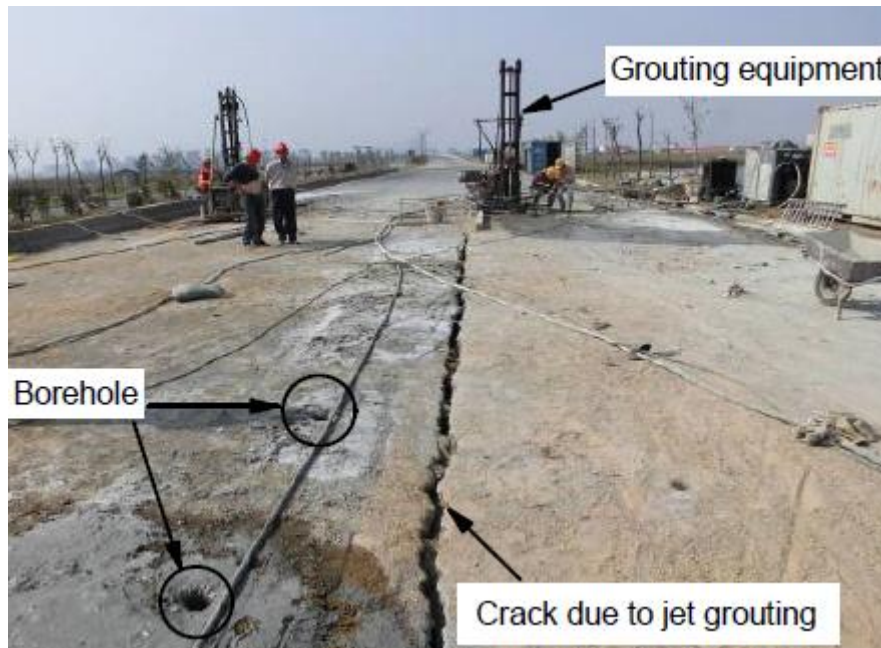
Crack due to jet grouting on the Linhai Highway (Wu, 2016)
